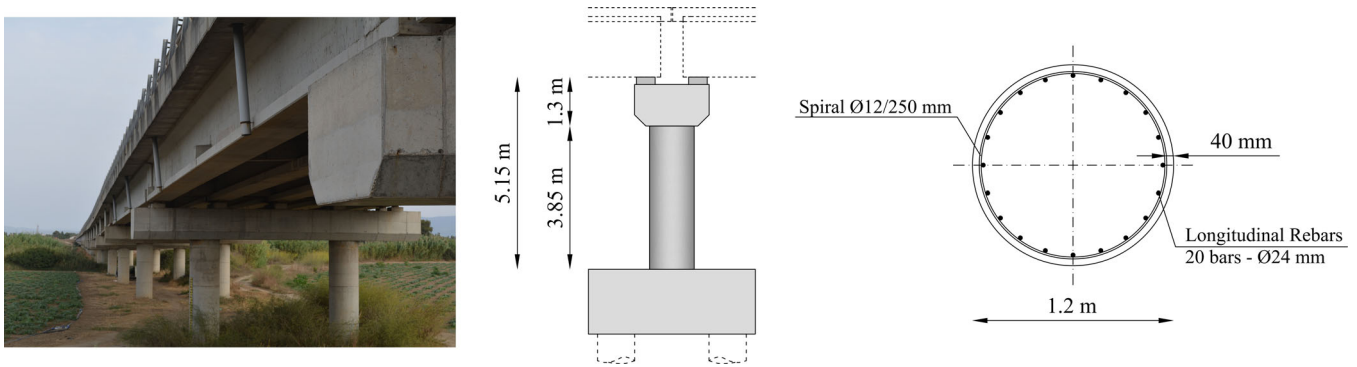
Picture of the reinforced concrete bridge selected as a case study together with data about geometry and reinforcement of the considered column
